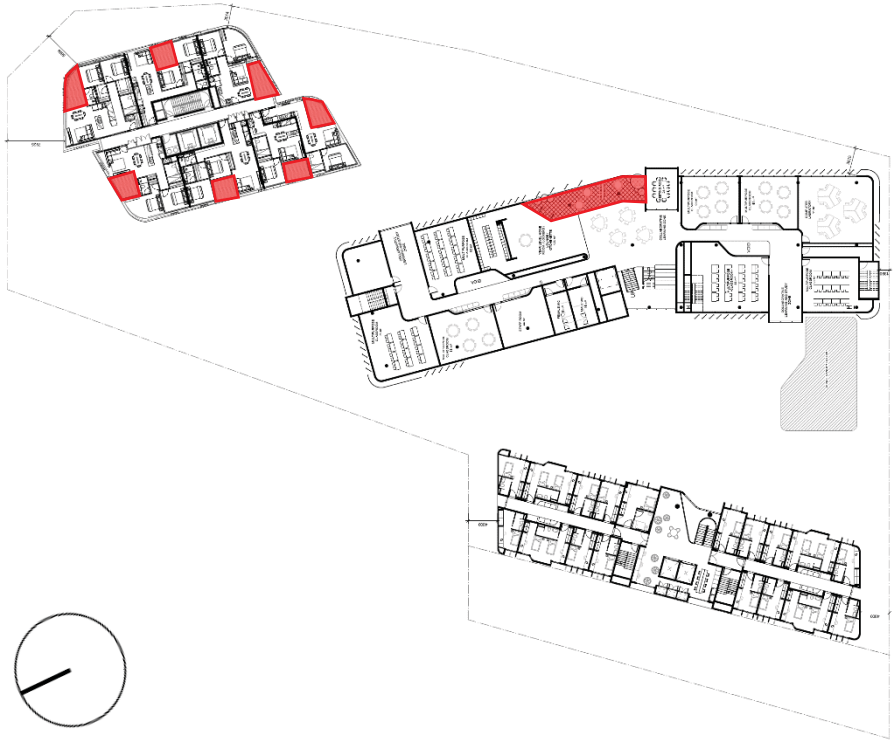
Schematic plan view of proposed development with recommended wind criteria overlaid on level 1 of the proposed developments
